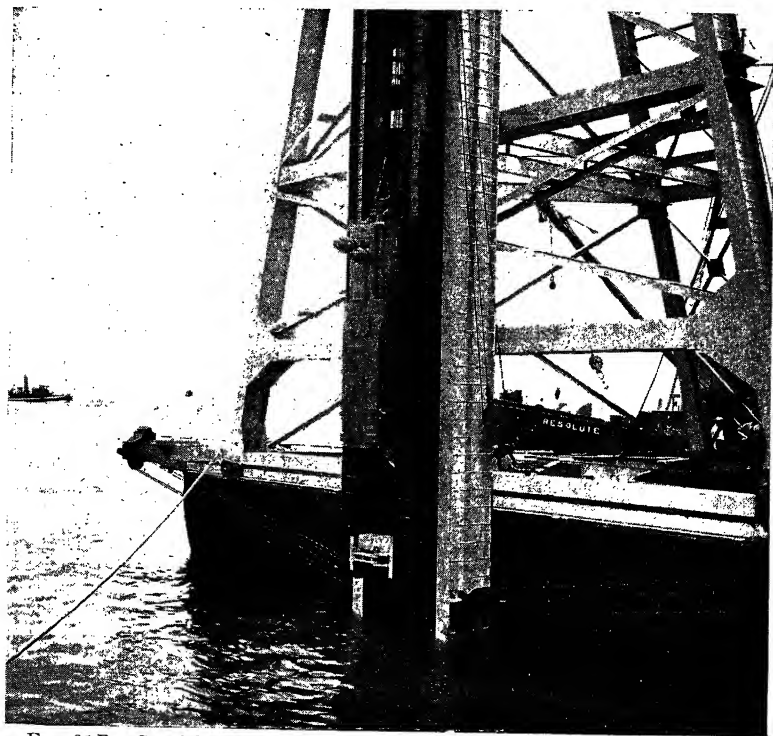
B.—Special heavy double-acting McKiernan Terry steam hammer.
